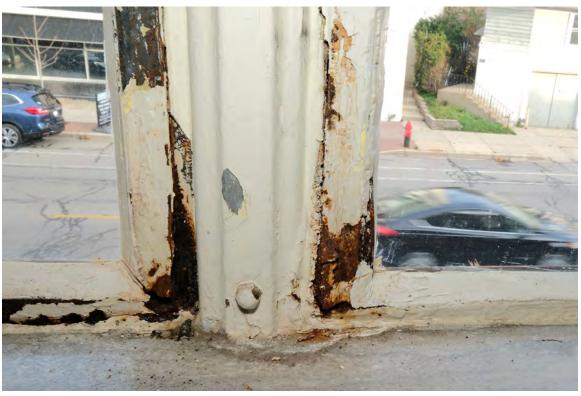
View of typical corrosion at window frame corners at center mullion. Preserve, LLC 2021.
